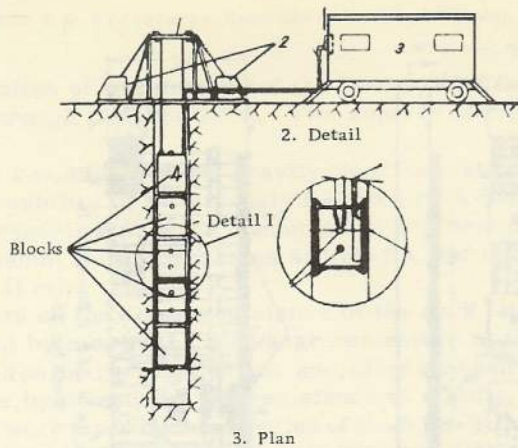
Schematic diagram of mobile testing machine for determining the deformation modulus of rock foundations
